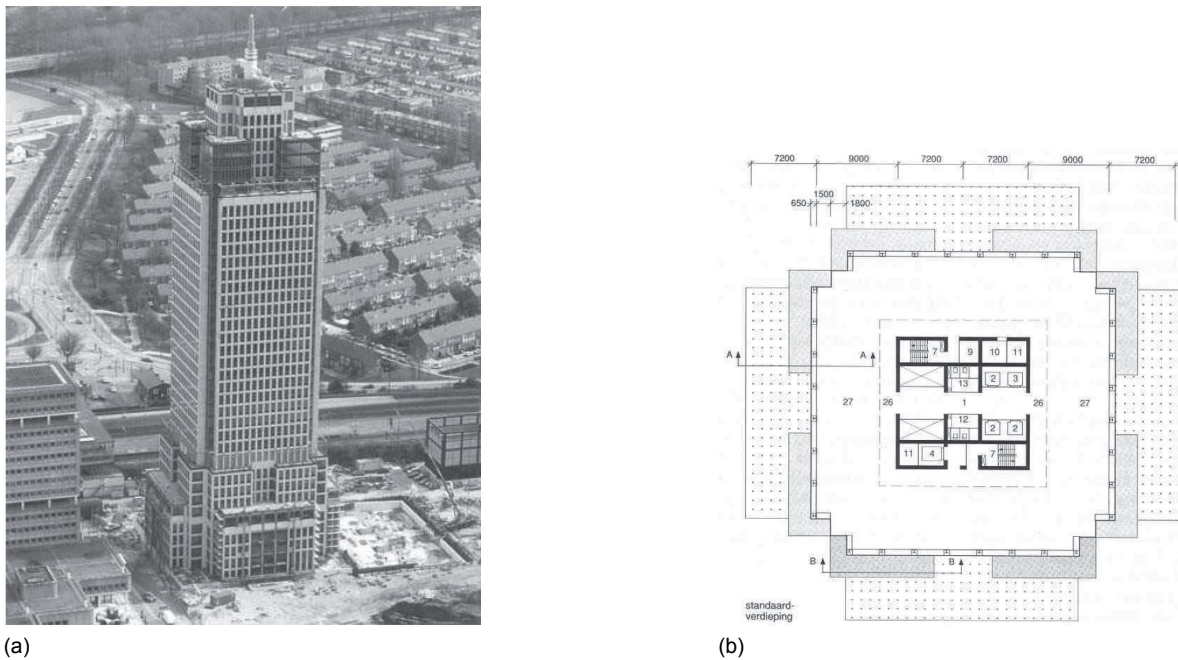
Rembrandt Tower in Amsterdam (2.5a) and floor plan of Rembrandt Tower (2.5b) [28]
